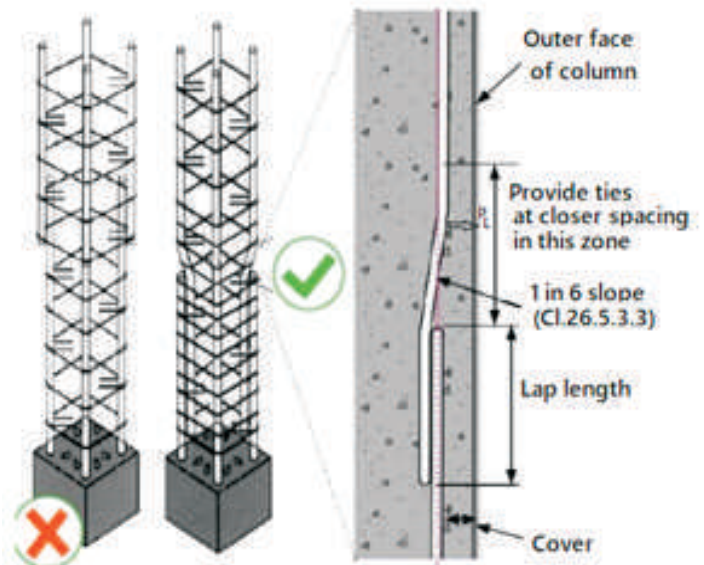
Splicing/lapping of column bars Beam-column or Slab-column Joints
